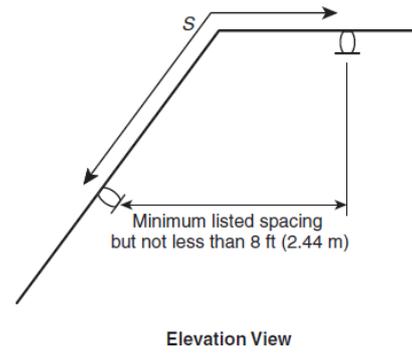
(b) Minimum Distance Between Sprinklers with Sloped Ceilings — Arrangement B.
